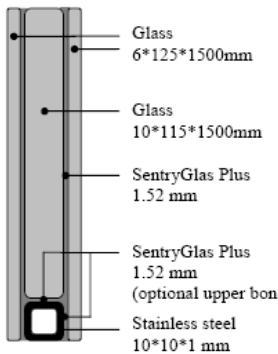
Section design of SG-laminated, stainless steel reinforced glass beam.
